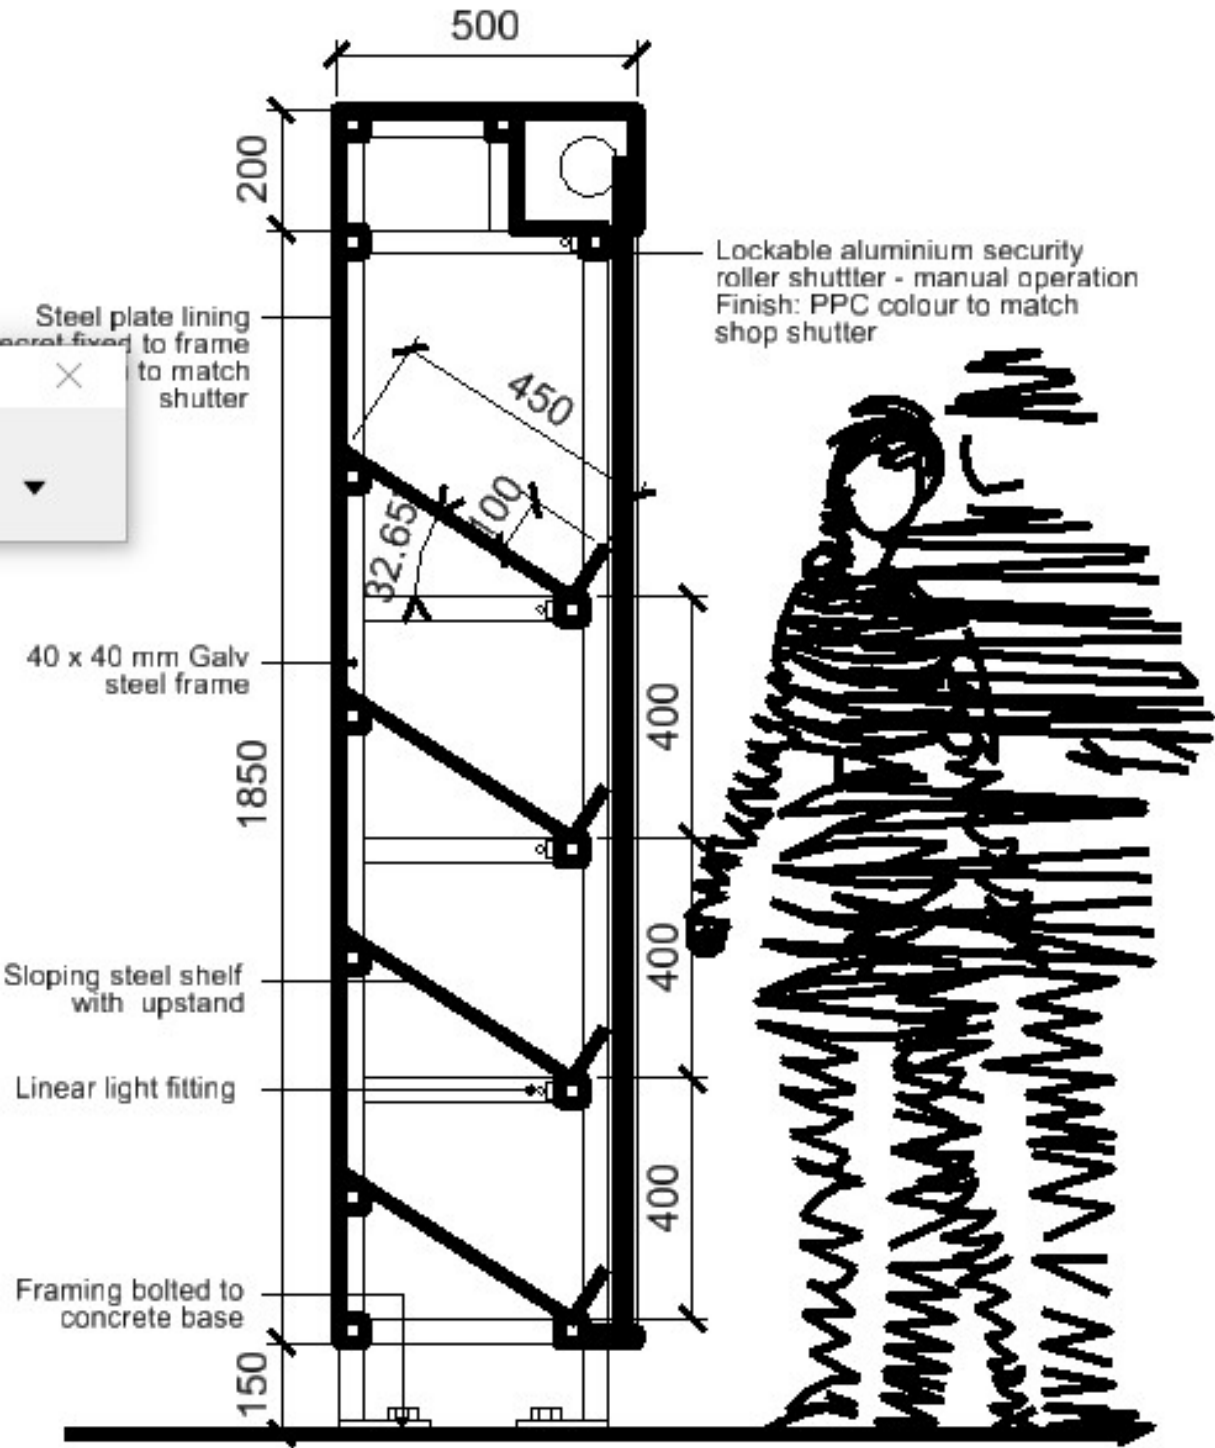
Section through proposed Secure Storage Unit with 4 no. raking shelves
